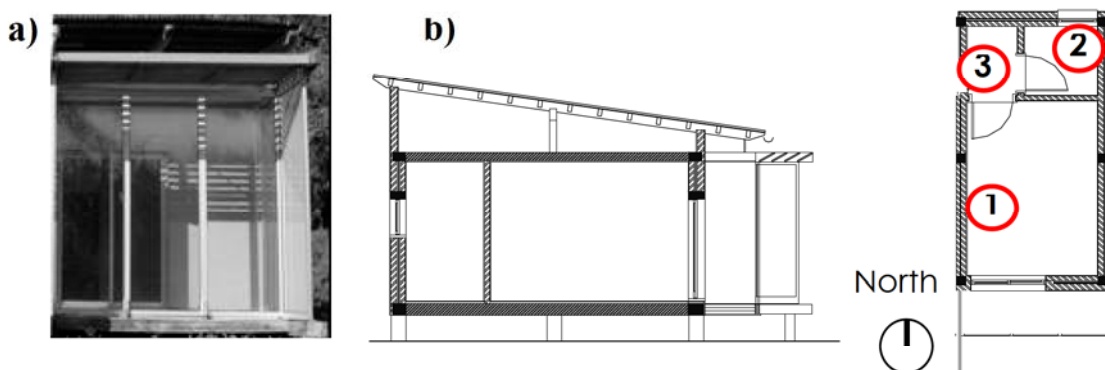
Conventional Test Cell: a) Photo; b) lateral view; c) plan view
